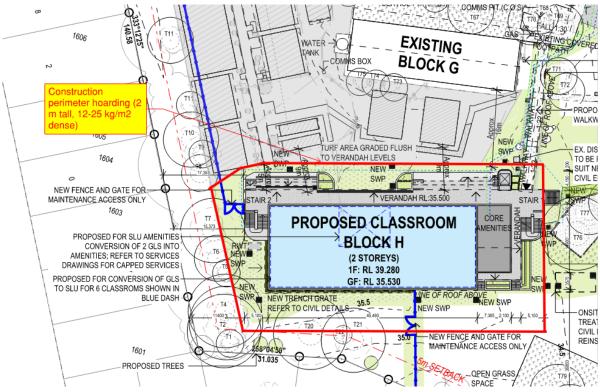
PROPOSED LOCATION FOR CONSTRUCTION PERIMETER HOARDING
